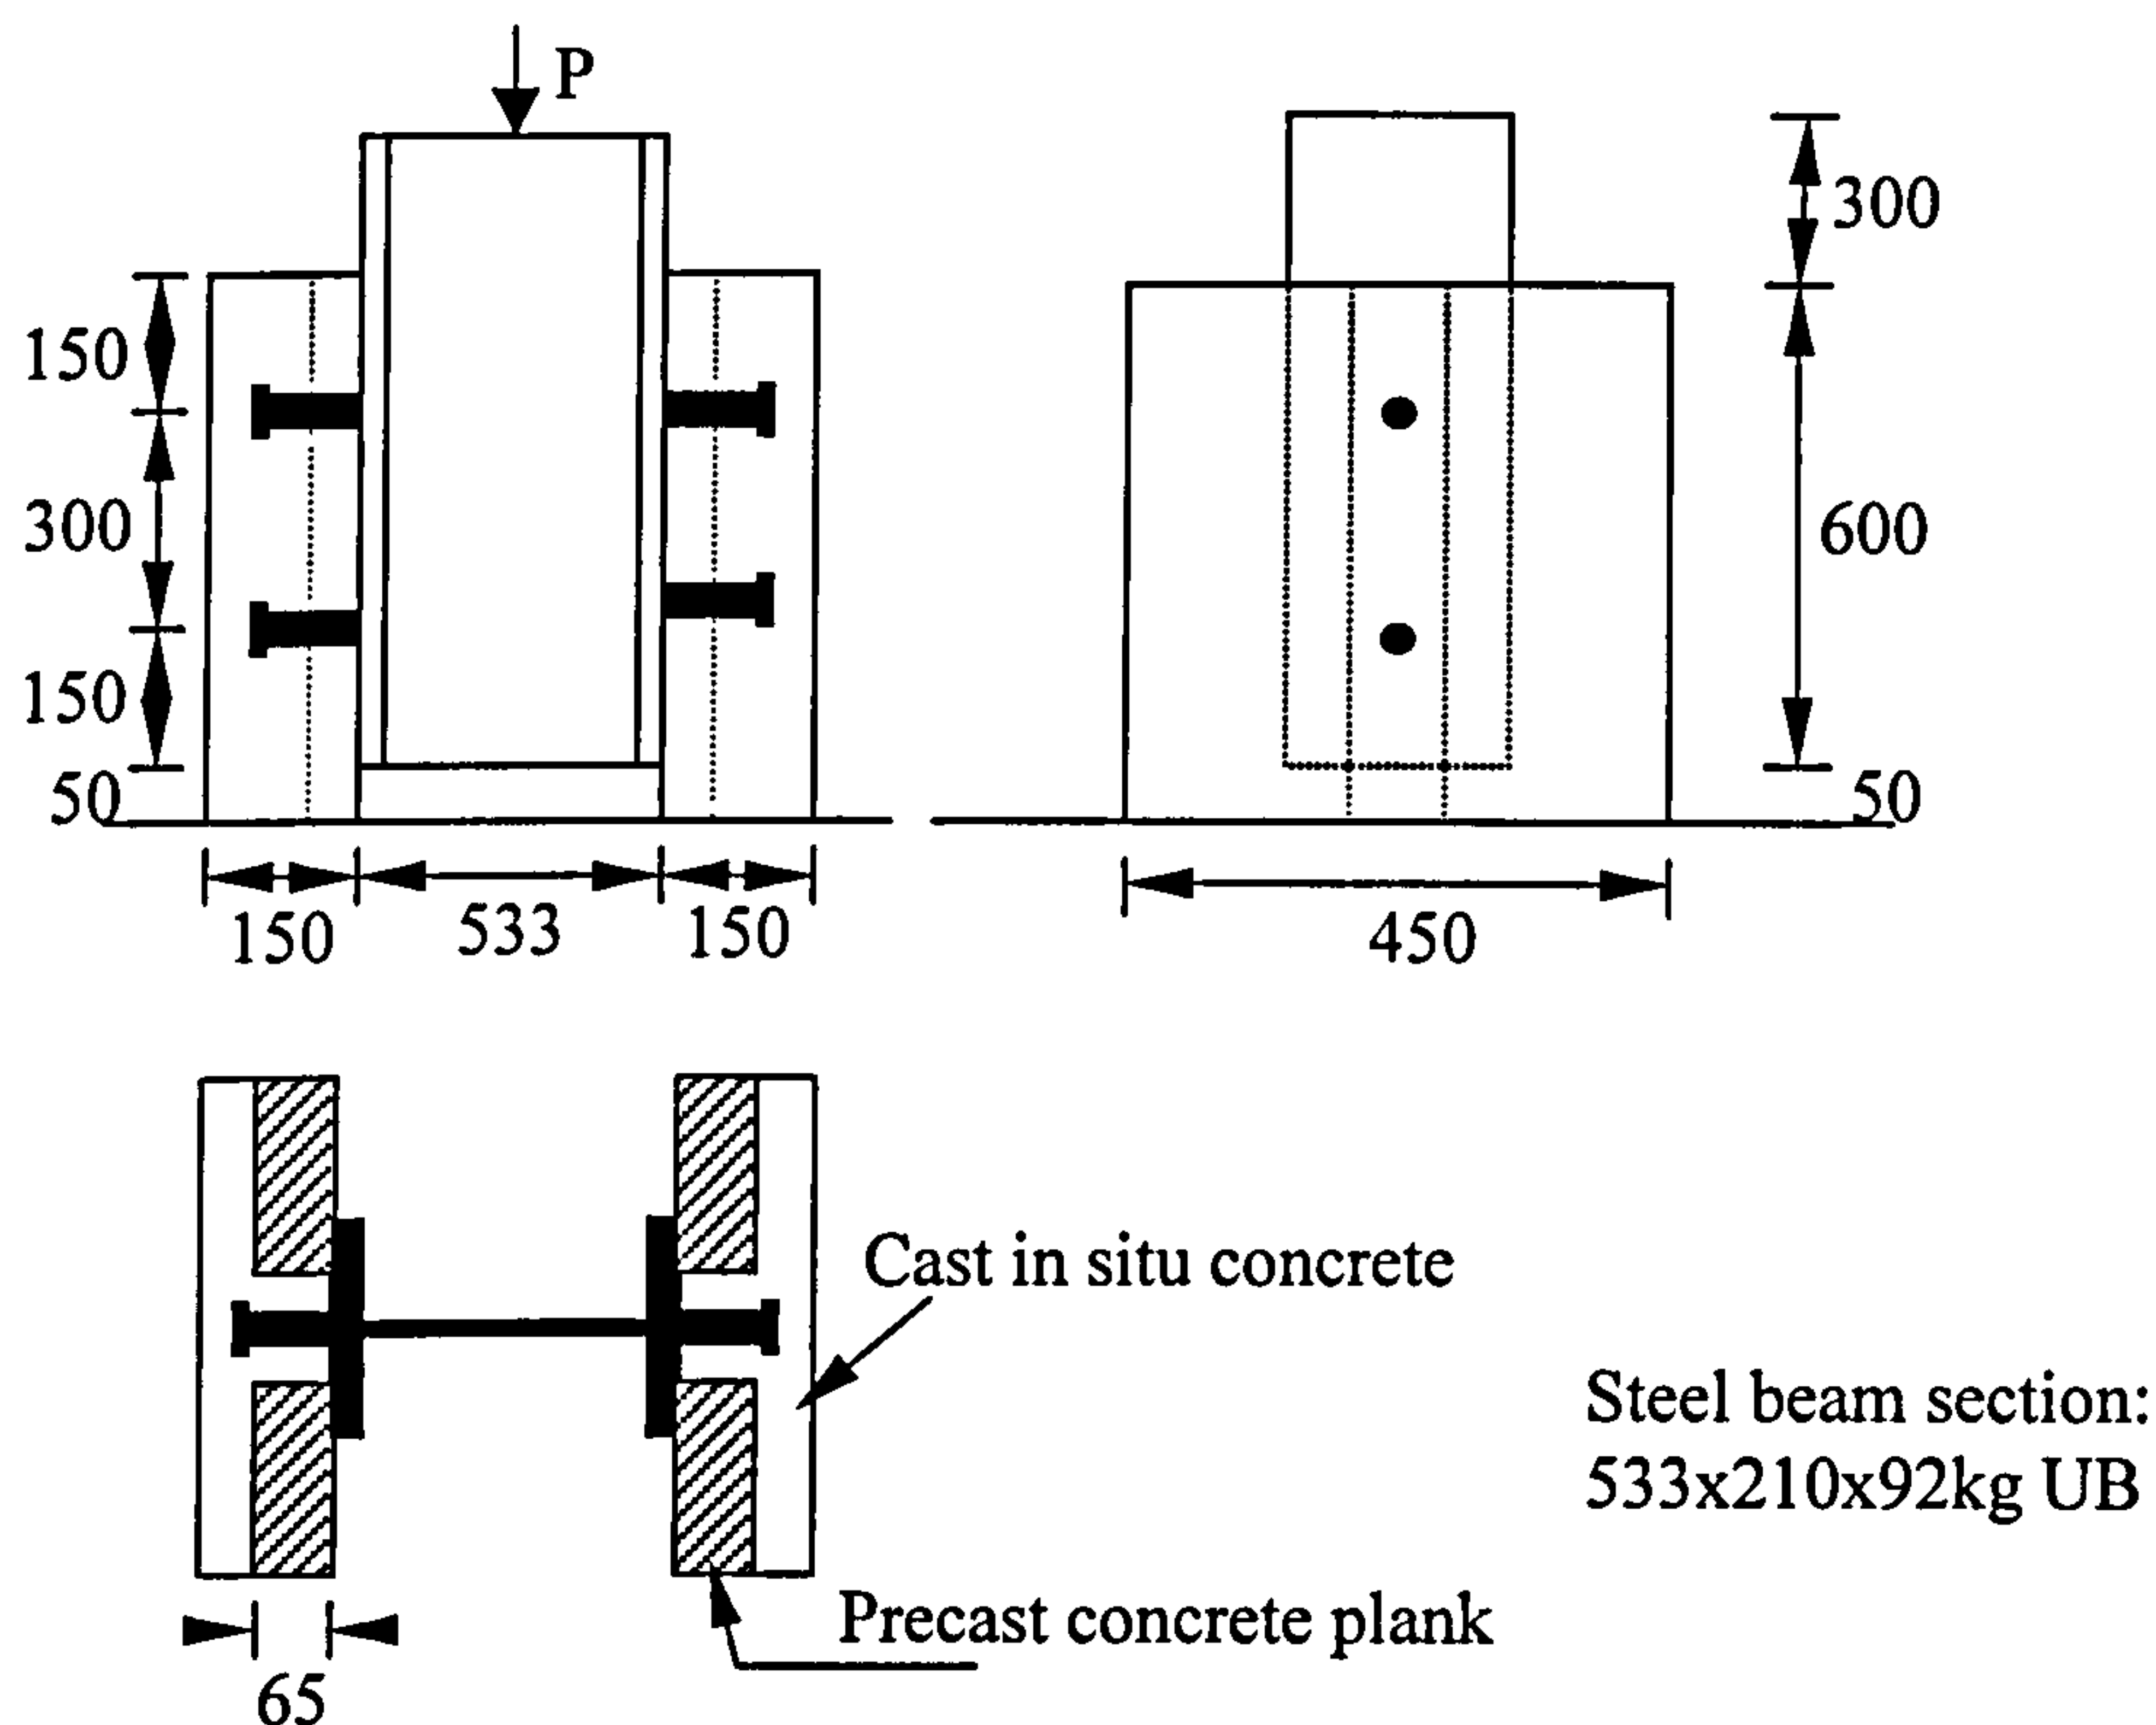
Details of push-off test specimen conducted by Moy and Tayler
